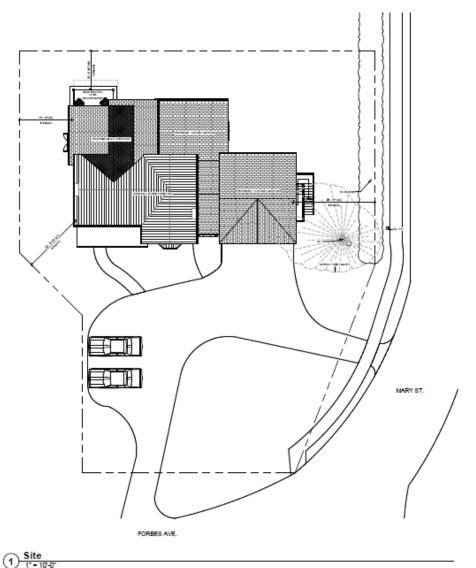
Proposed Site Plan, A107 (Image: Eton Merritt, Rhodes Design Management, August 20, 2024)
